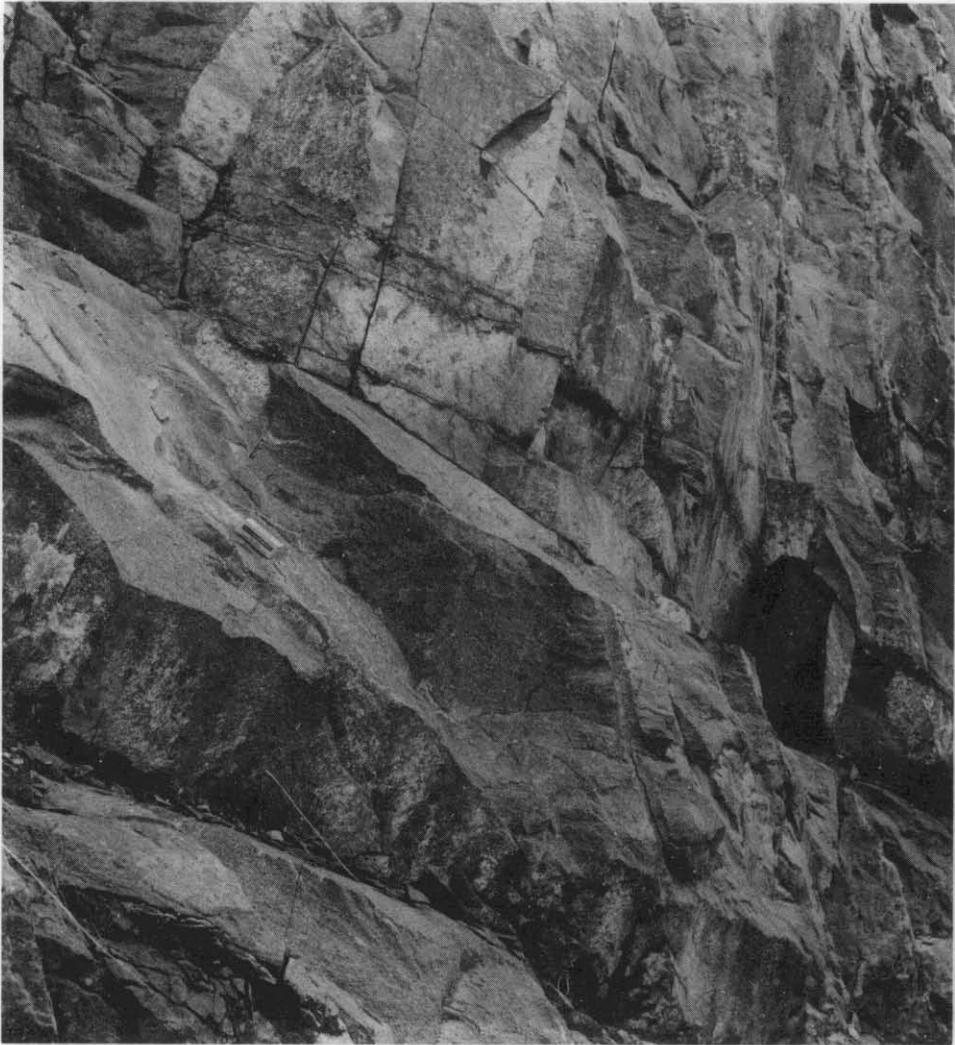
Tolmans Hill cutting. Sub-horizontal joints with dip towards the road.
